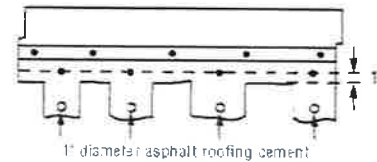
Fastening Presidential and Presidential TL Shake shingles on steep slopes.
